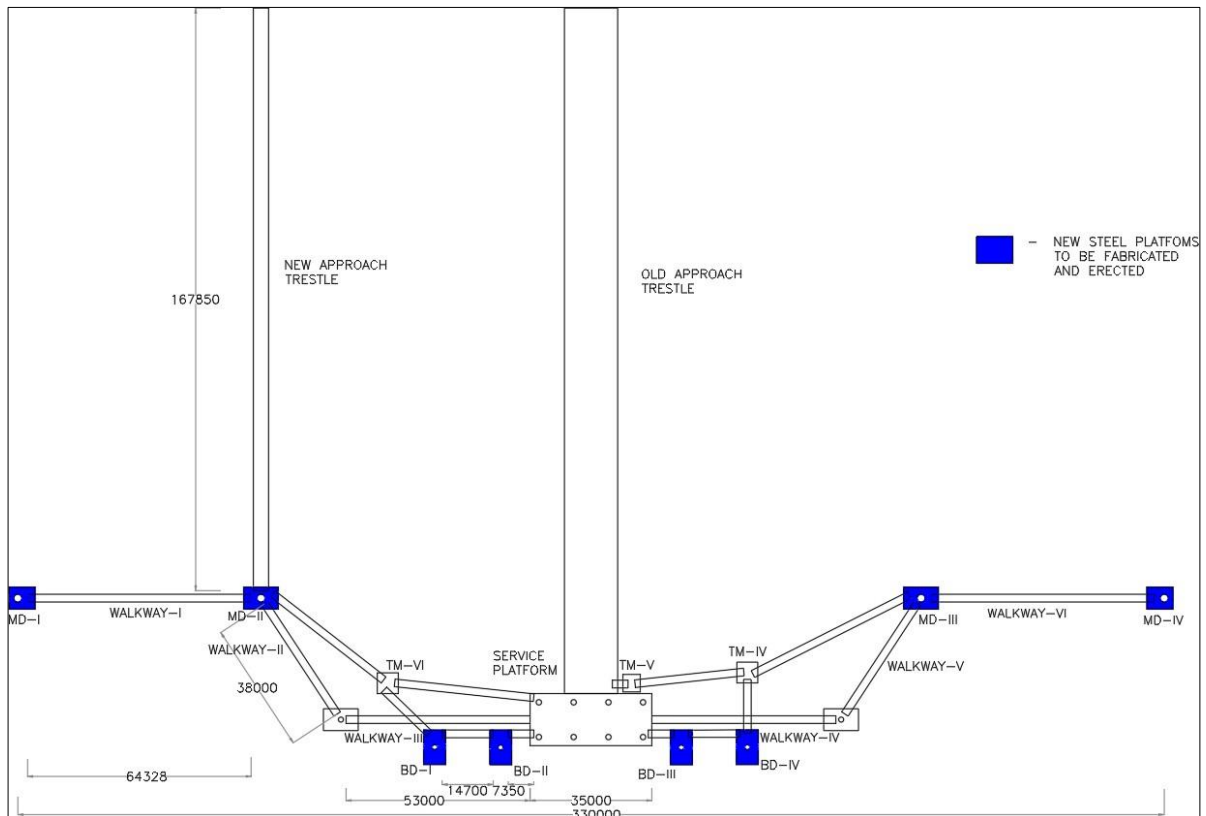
GA showing the platforms to be strengthened (Dimensions are tentative)
